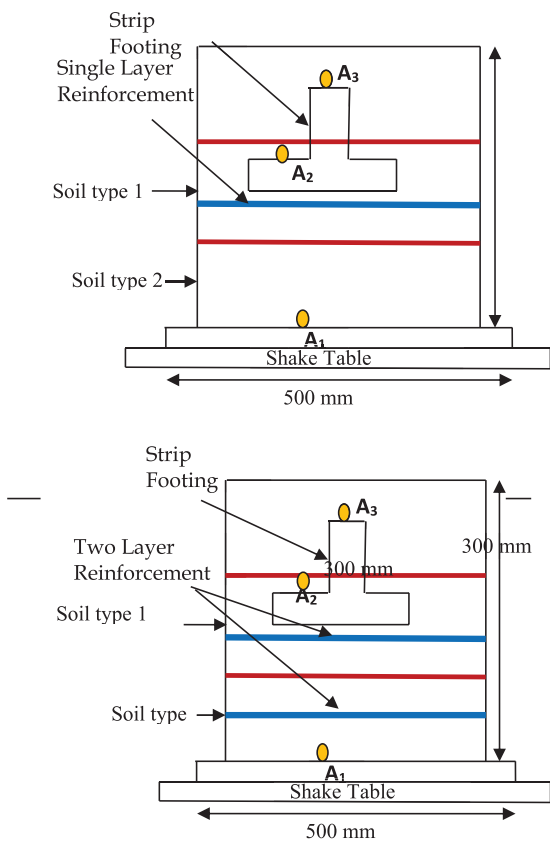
Schematic diagram of reinforced model test strip Footing. (a) Slope with single layer reinforcement. (b) Slope with two layer reinforcement (c) A1, A2, A3: Accelerometers.
